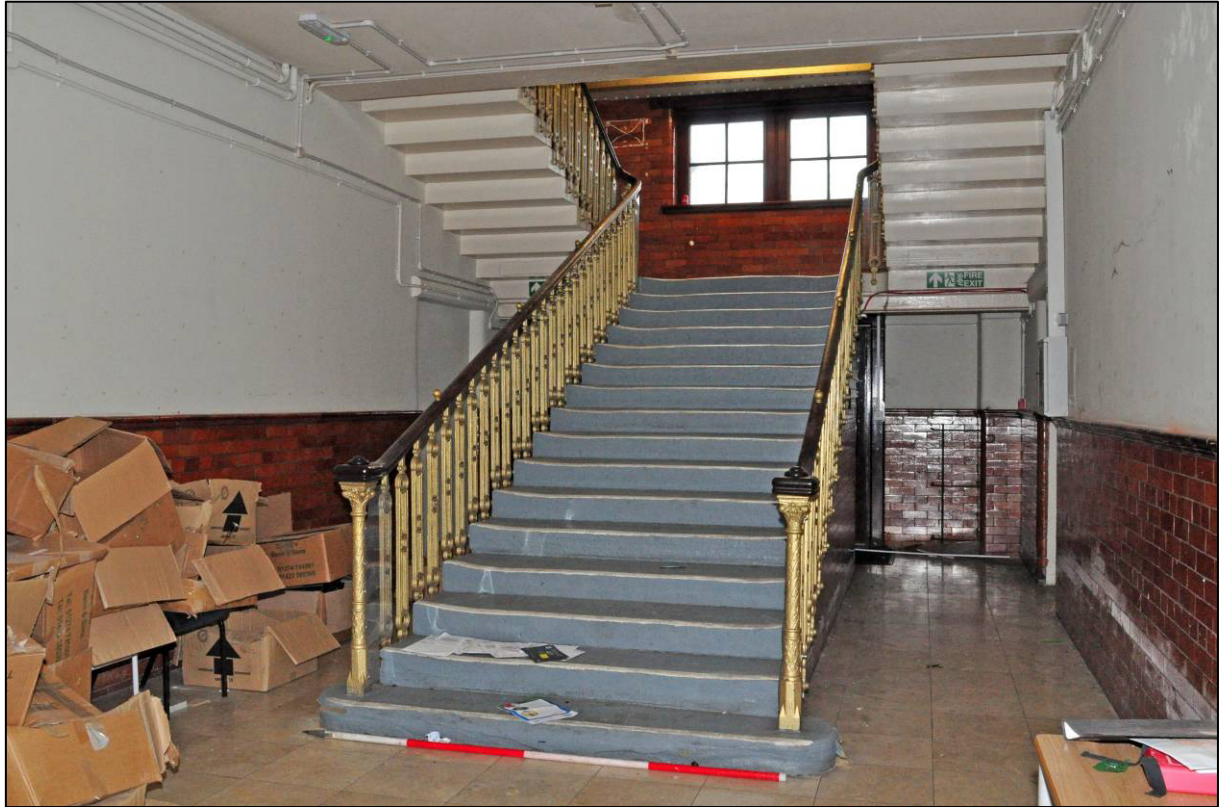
1895 Higher Grade Boys' School, stair hall (GF14), main stairs, looking E (photo 2203).
